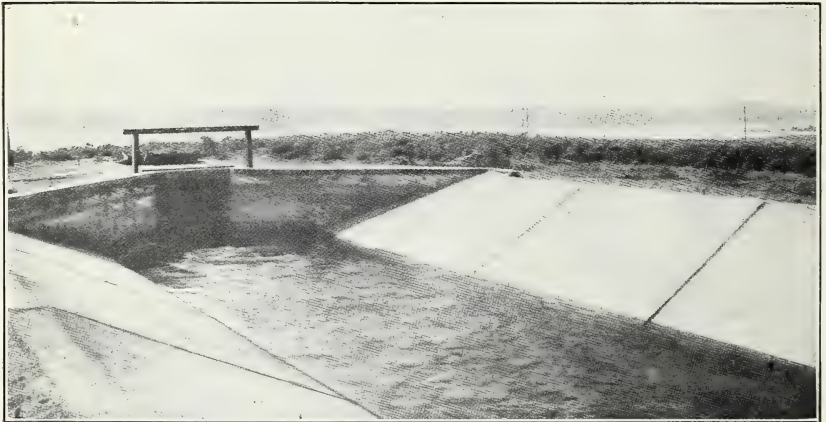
OUTLET STRUCTURE, PUMPING LINE OF PASCO RECLAMATION CO., WASHINGTON. (No. 38.) Discharge measured by rod floats in this concrete section.
